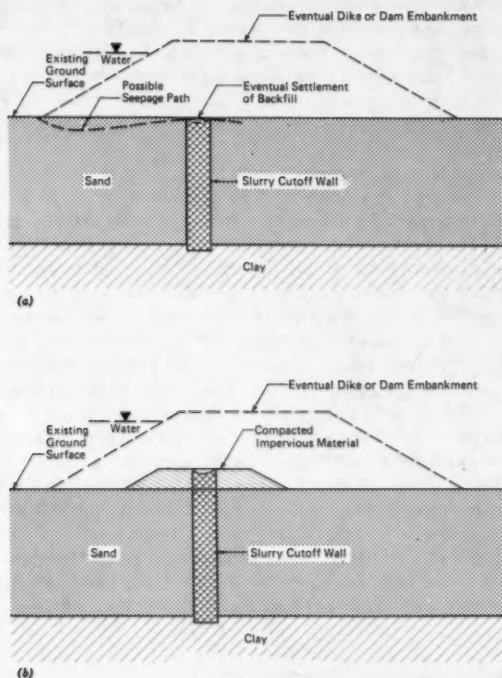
Connection Detail for Soil-Bentonite Slurry Trench Cutoff Under Embankment
